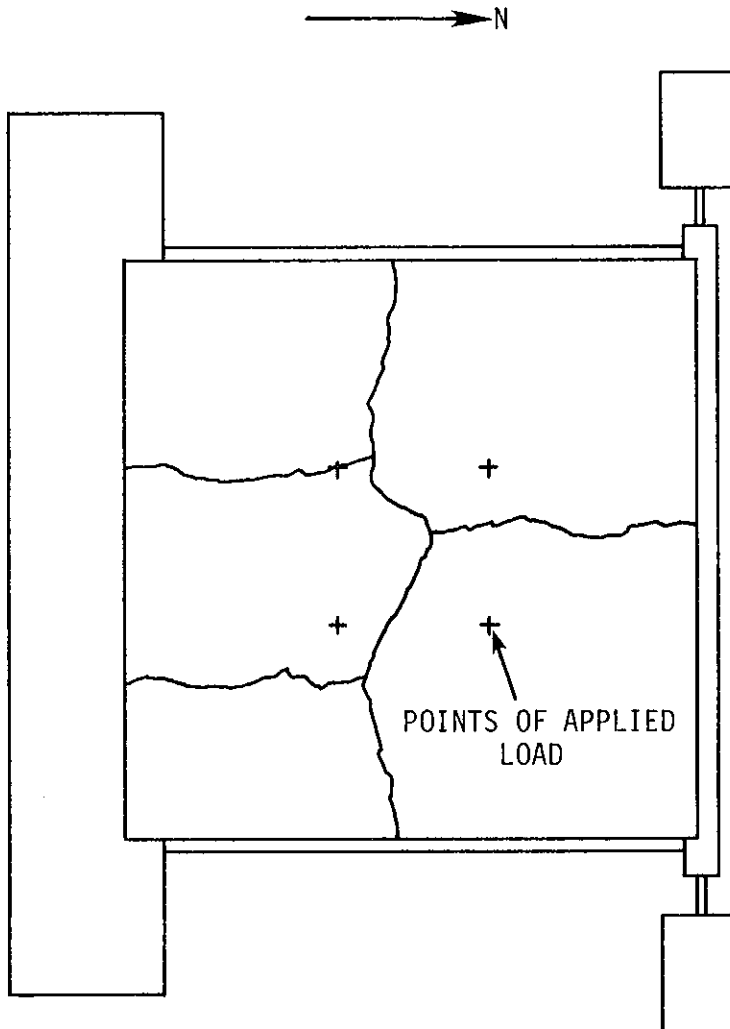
Slab 6 final crack pattern after application of vertical load.
